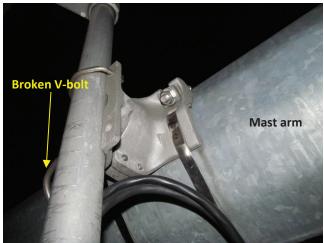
1 of 2 V-bolts broken at gusseted tube connection to orbital bracket
